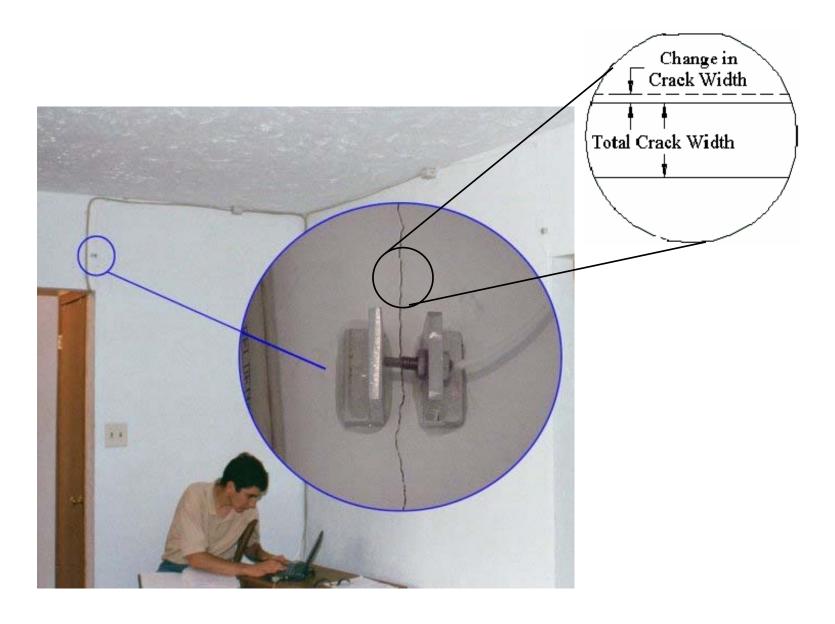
Typical threshold crack in a one-story concrete block house
